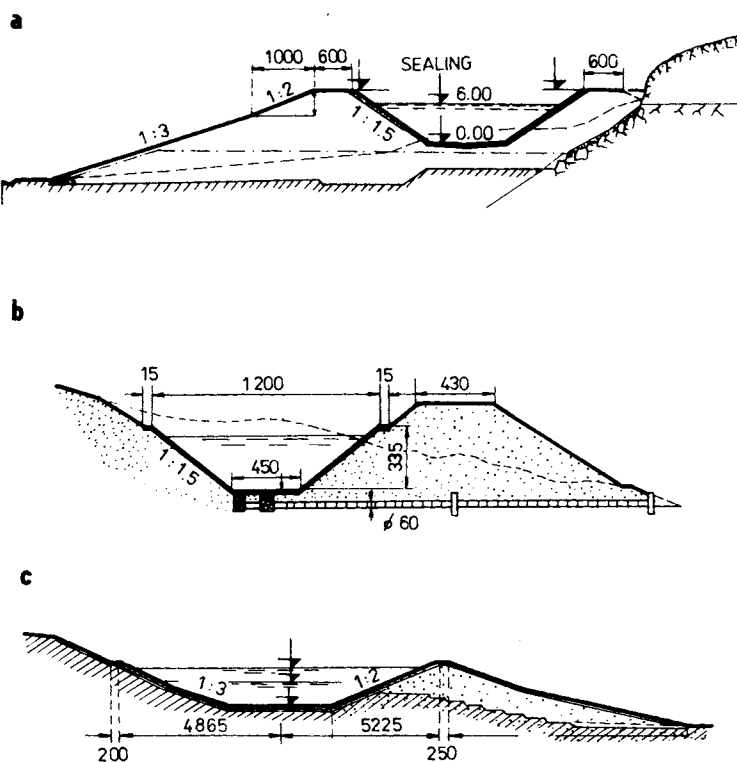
Canal-dam profiles in an inclined territory. a — asymmetrical profile with shallow tally mark, b — dam with parallel and cross drainage, c — stepwise footing bottom of dam.
